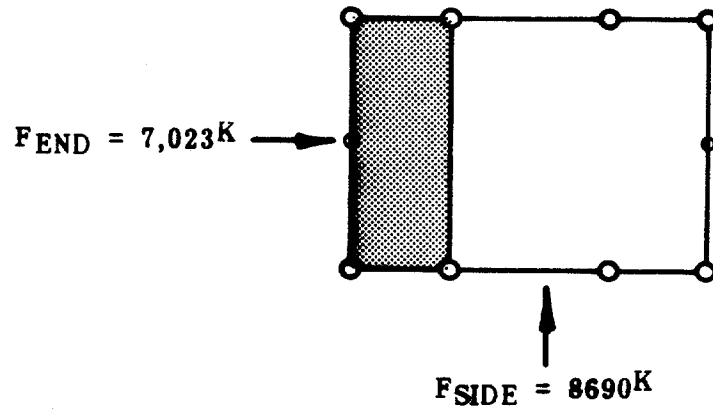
TYPICAL PLAN OF THE CONDUCTOR CAGE PROTECTION SYSTEM
